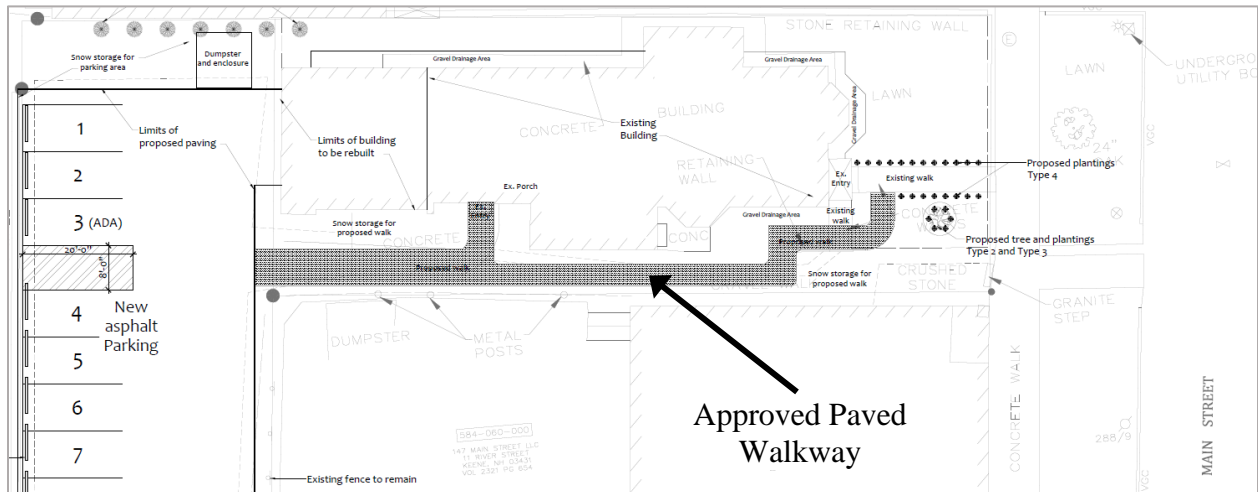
Image from the proposed site plan submitted by the applicant, which shows the proposed walkway shaded in dark gray.
